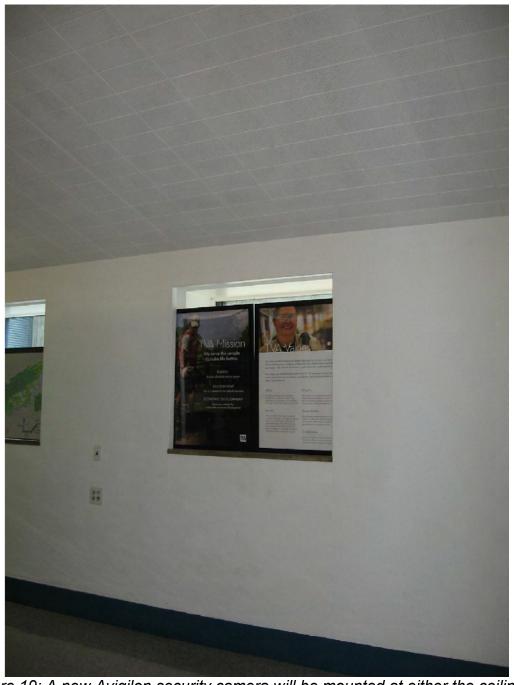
A new Avigilon security camera will be mounted at either the ceiling or wall at this location just inside the southwest Control Room door.
